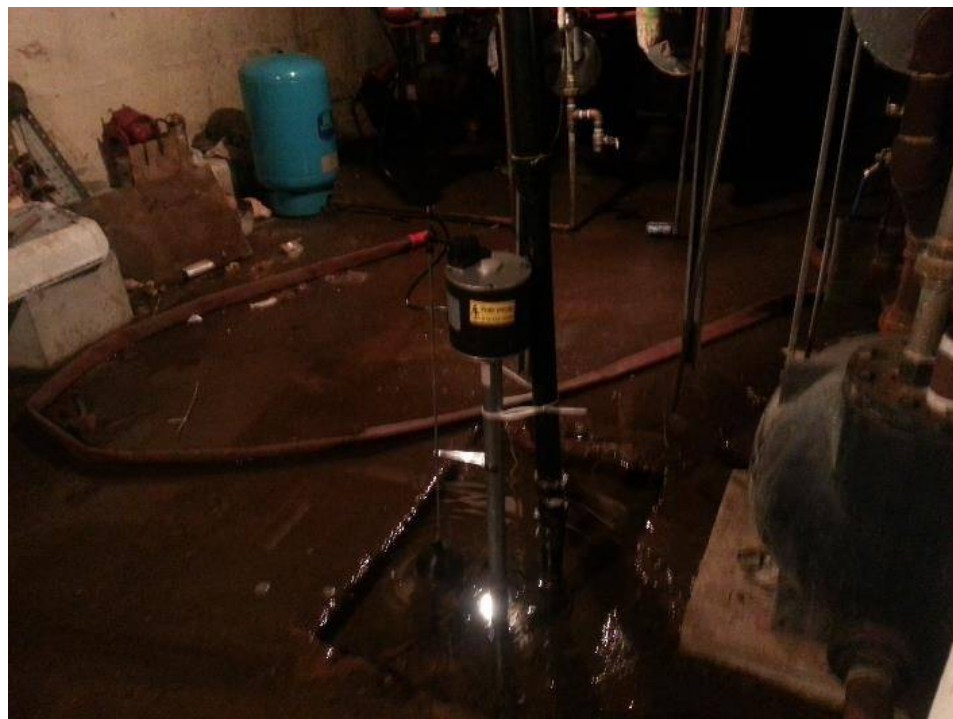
View of interior of Building 543, facing south (April 7, 2014)
